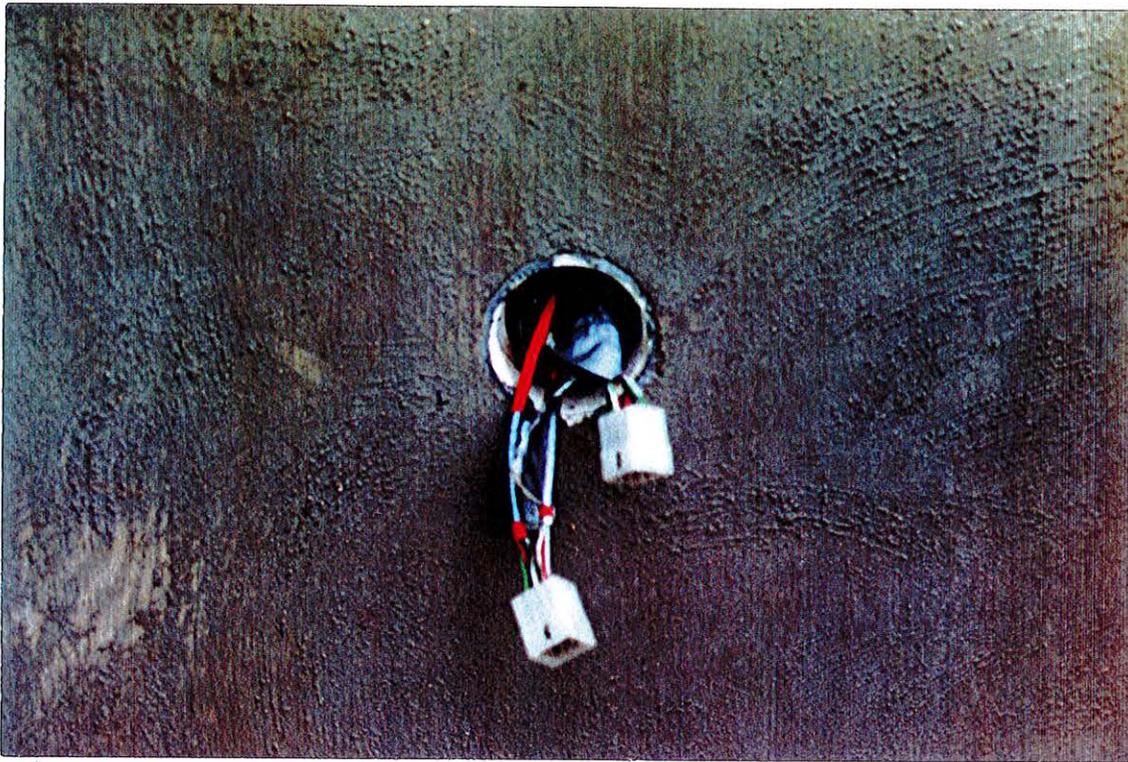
Plastic Fitting Cast In Backwall Allowing Instrument Cable Access
